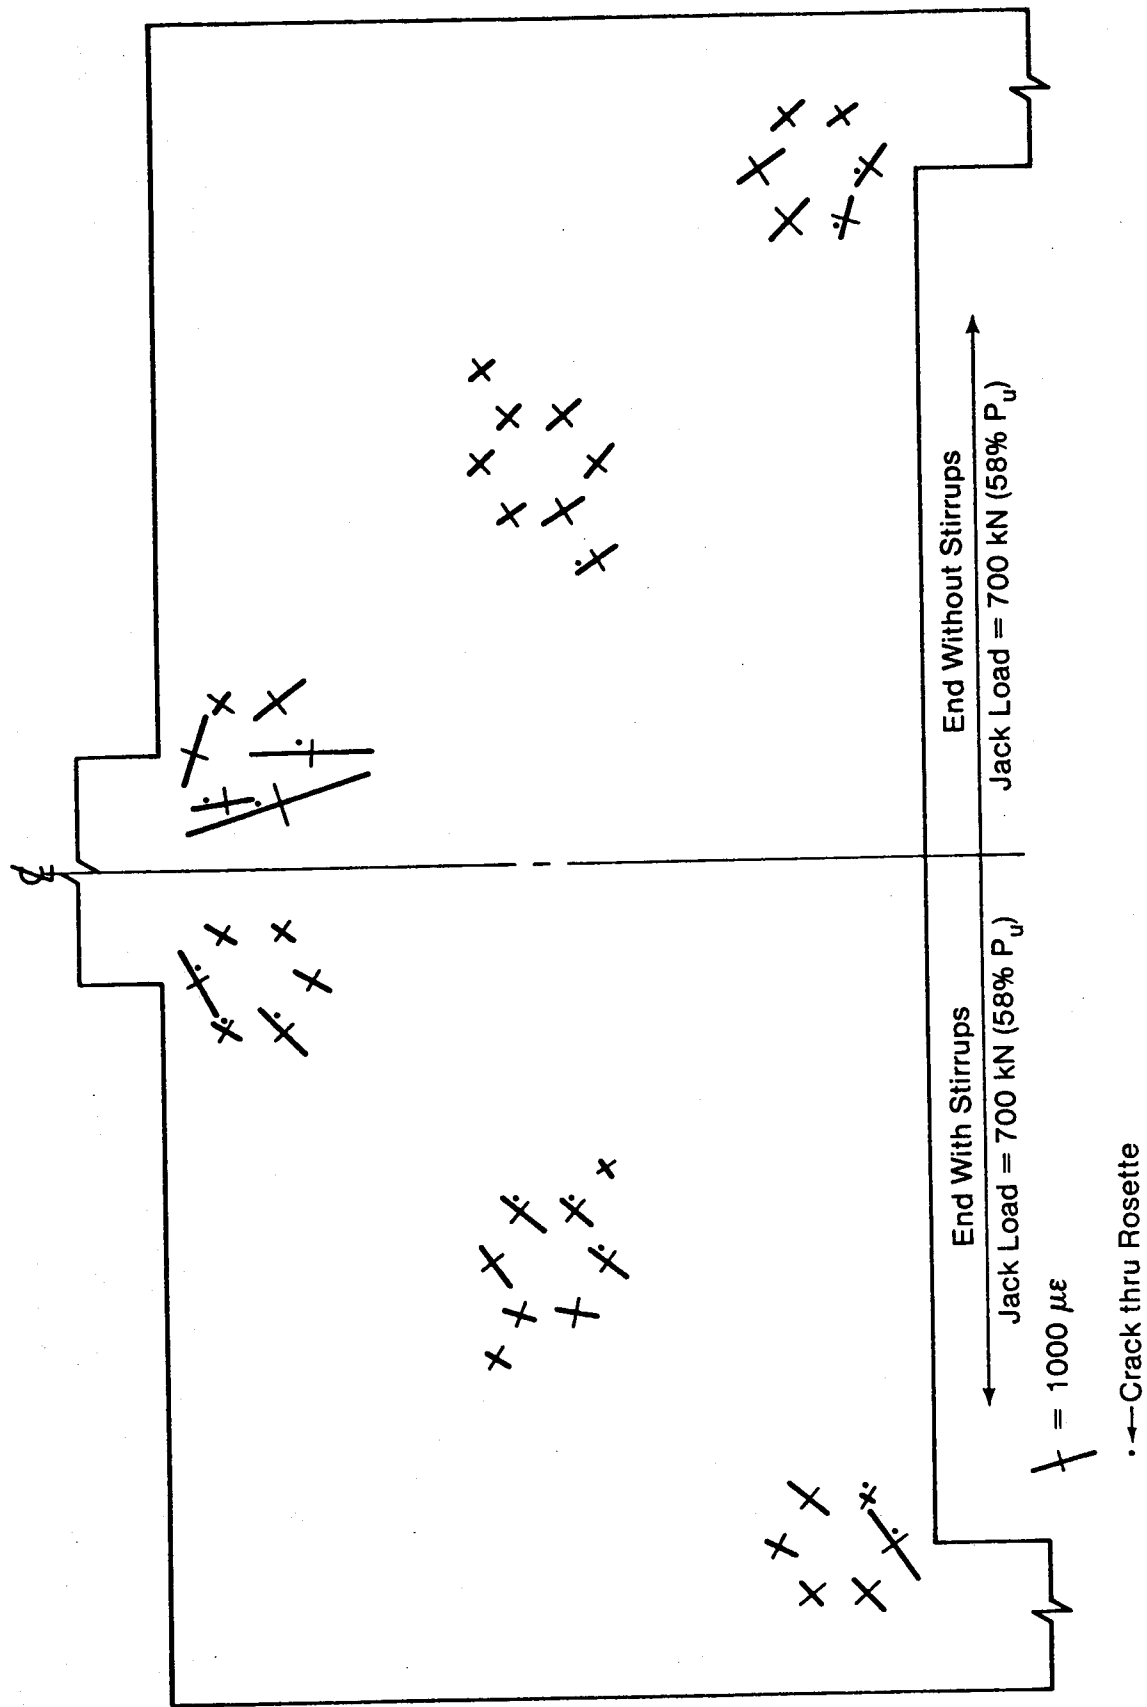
(b) Beam 1/1.0 Concrete Compressive Strains
